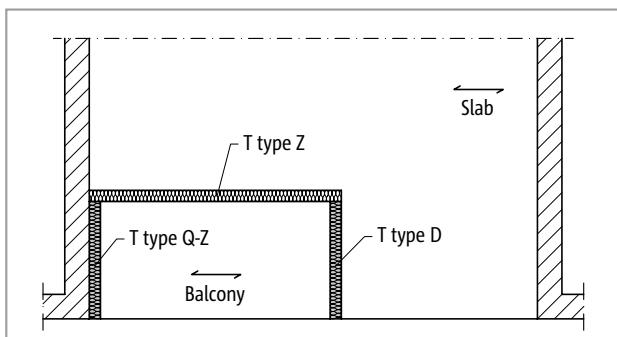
Schöck Isokorb® T type D, QZ; Z: One-way spanning
